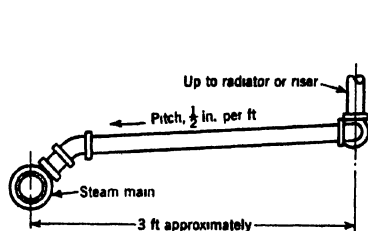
TYPICAL STEAM RUNOUT WHERE RISERS ARE NOT DRIPPED
